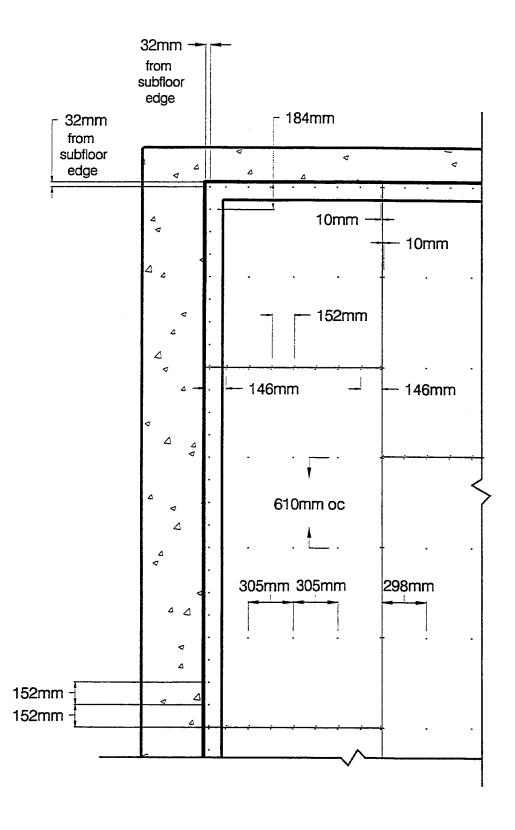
Screw pattern for single layer subfloor, joists 610 mm o.c (9 joists).
